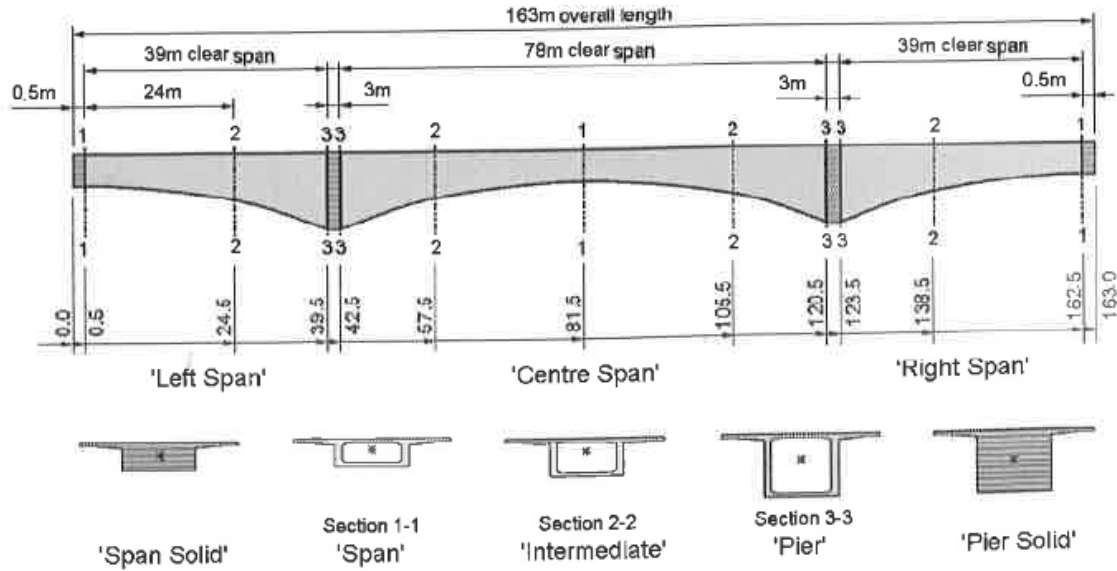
3-Span Concrete Box Beam bridge.
